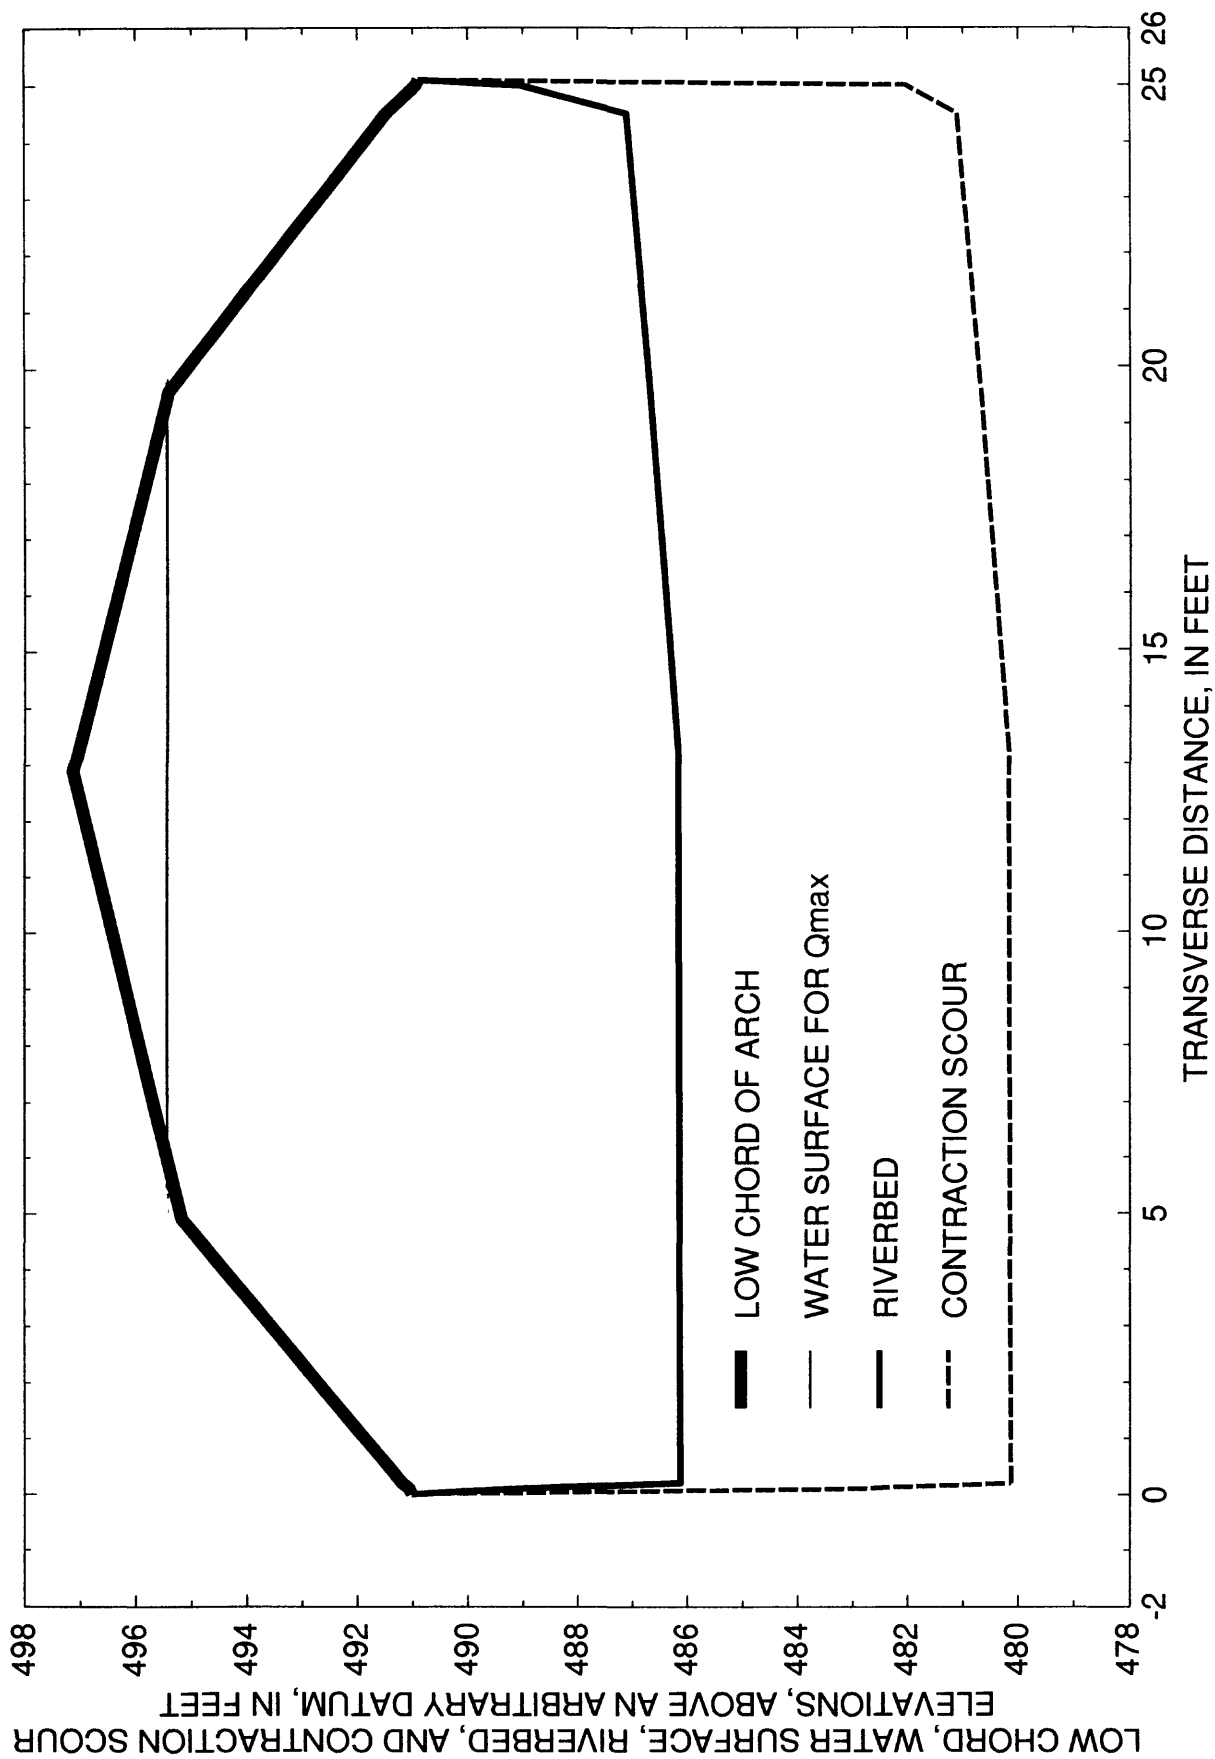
Cross section at the downstream face of bridge A07011, showing the low chord, water surface for the maximum discharge before pressure flow, riverbed and potential contraction scour.
